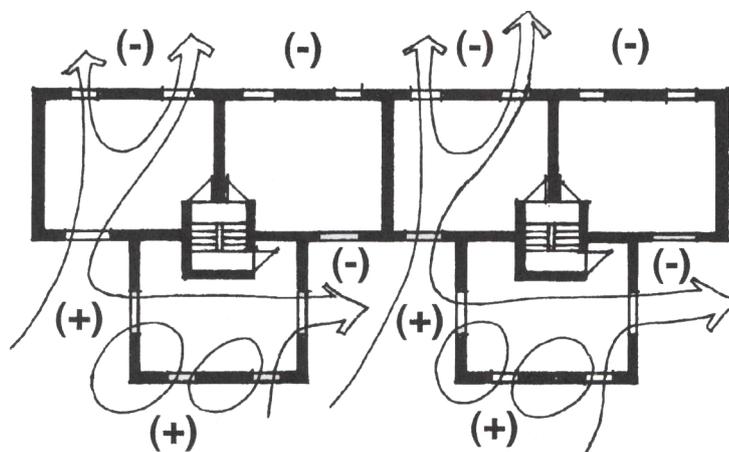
Ventilation potential in direct-access building with internal staircase (type-1)
